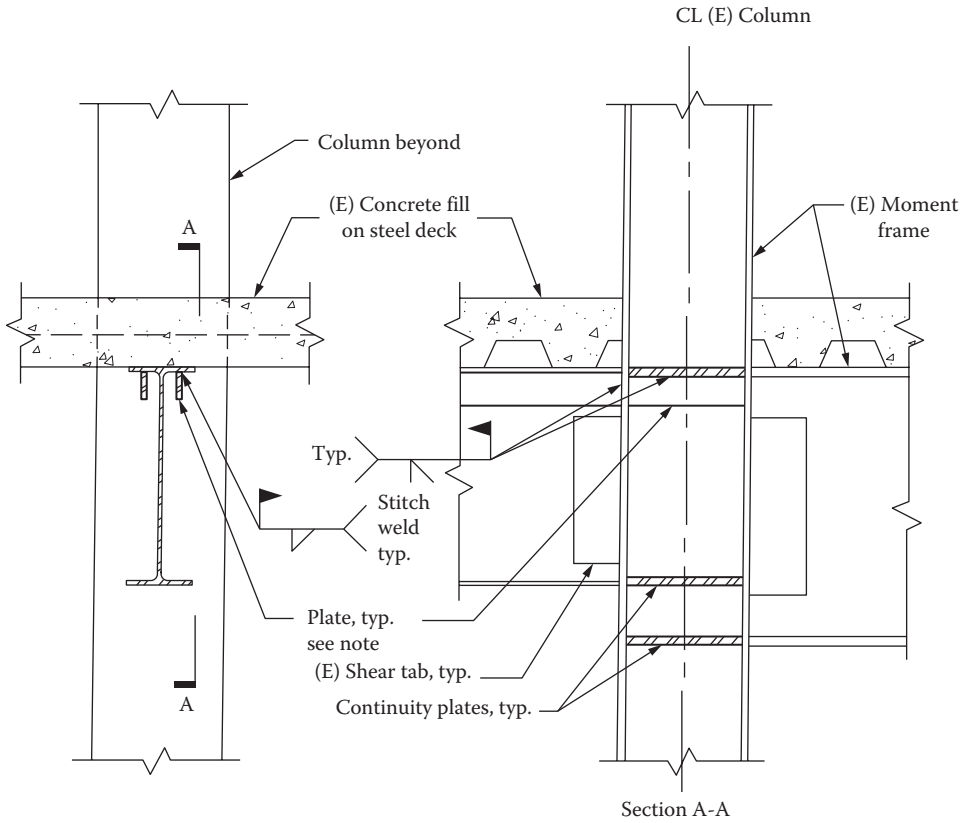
Plate collectors at existing beam. *Note:* Plates may be interrupted at column by shear tab from transverse beam. Provide complete joint penetration welds from plates to shear tab.
